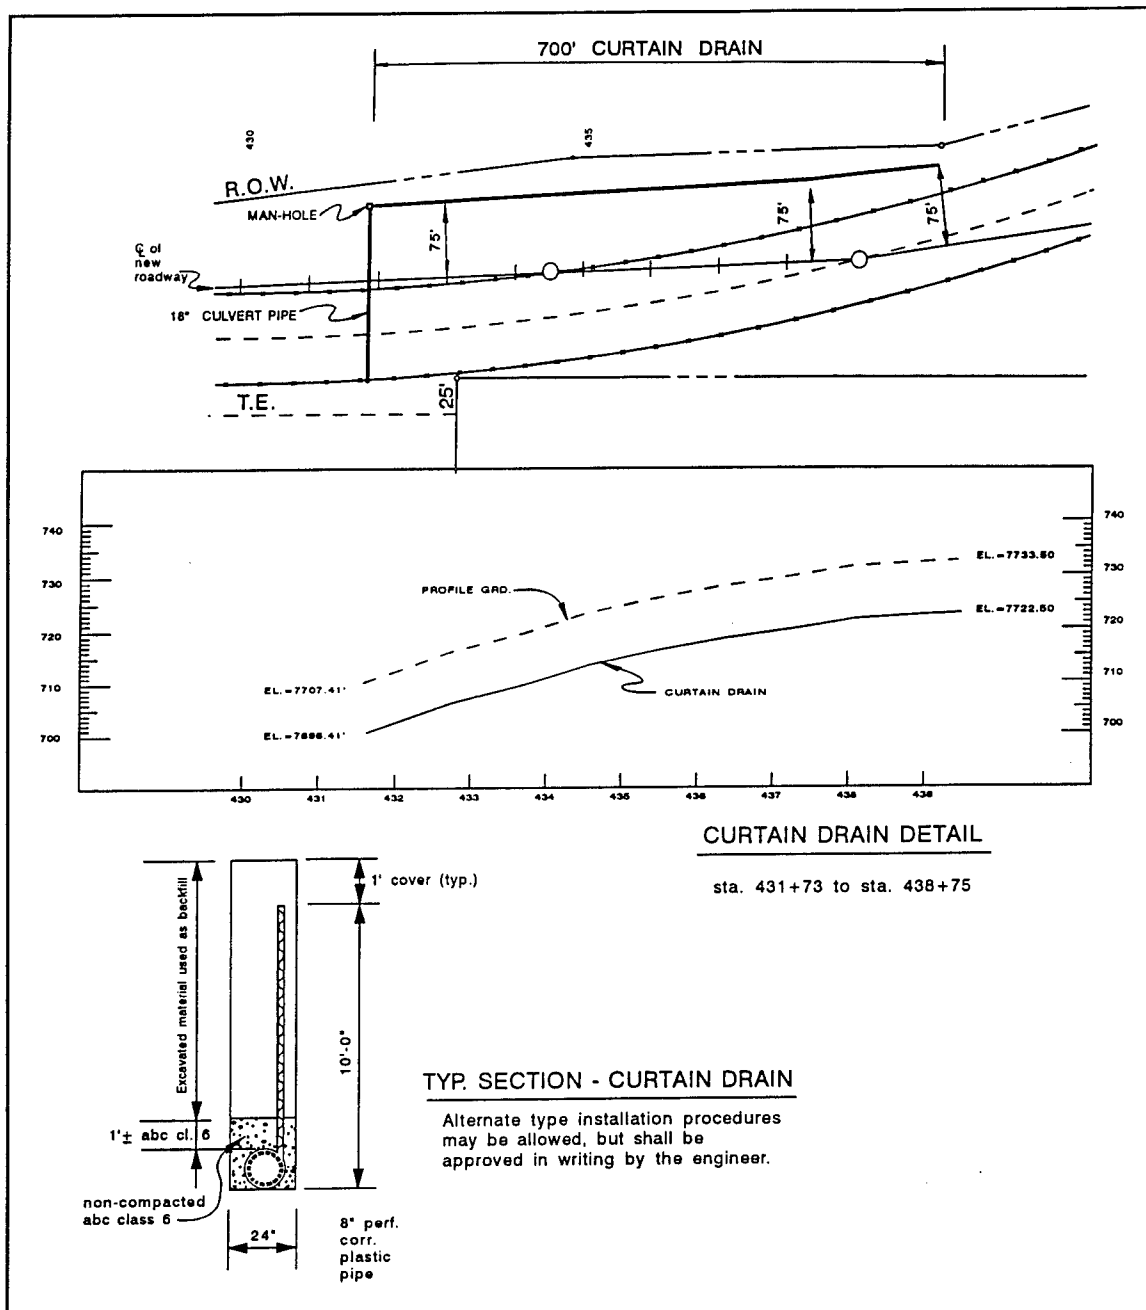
Plans for installation of curtain drains near Durango, CO (after Hunt 1993)
